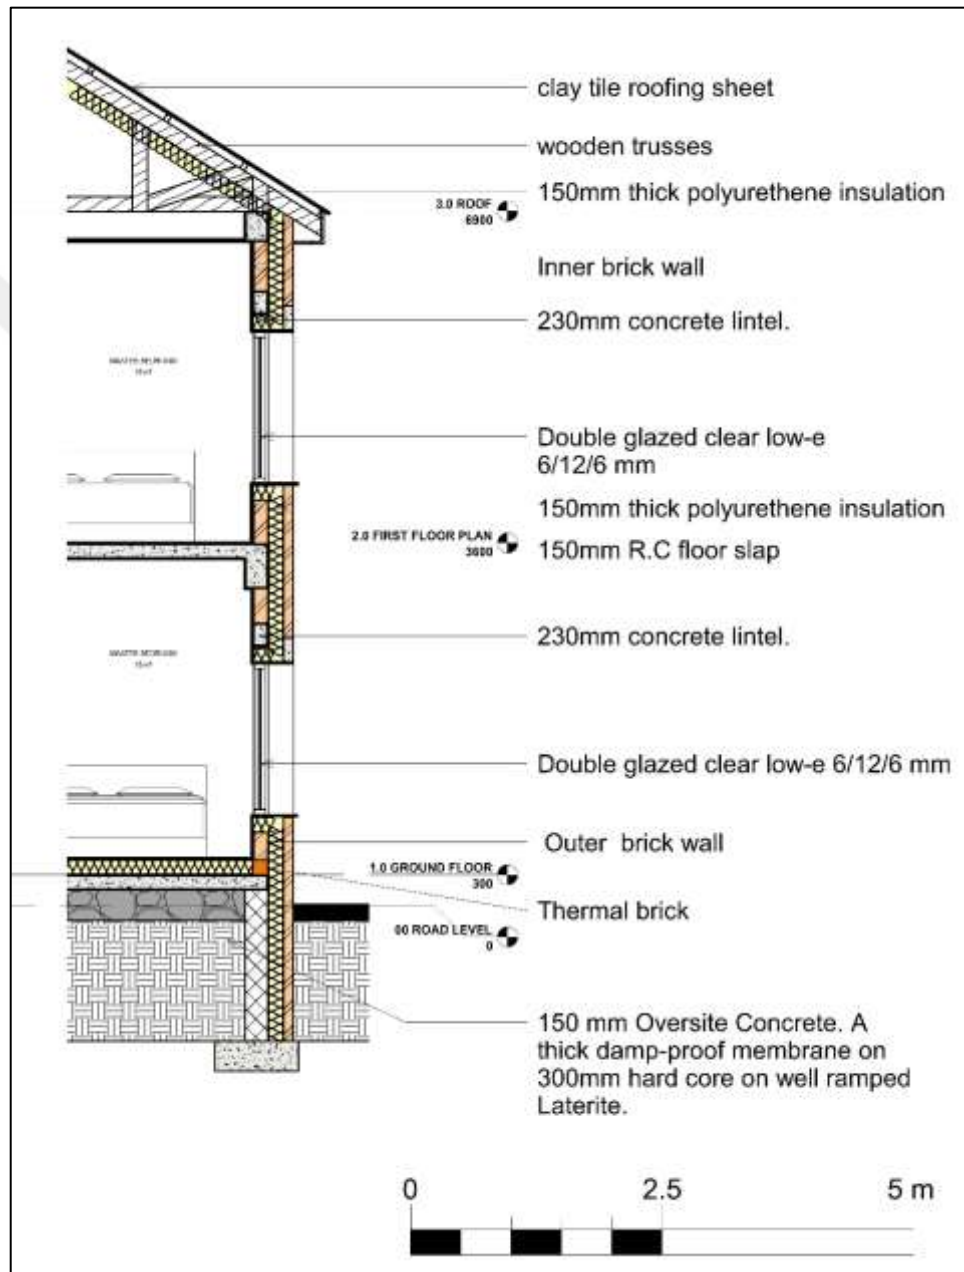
Envelope Detail of Improved Model, (Authors Sketch; Revit 2024).
